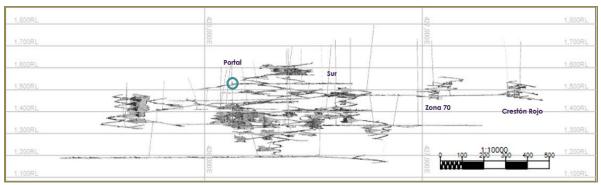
Plan View of the Los Filos Underground Mining Areas
